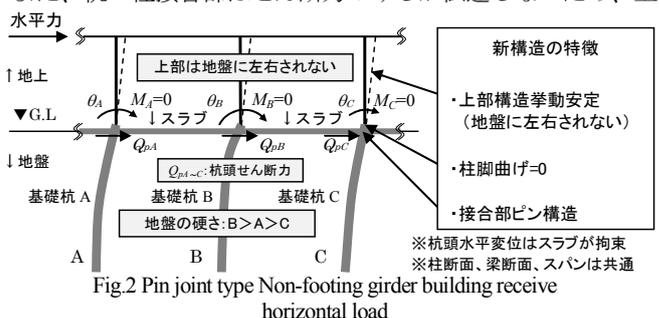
Pin joint type Non-footing girder building receive horizontal load
